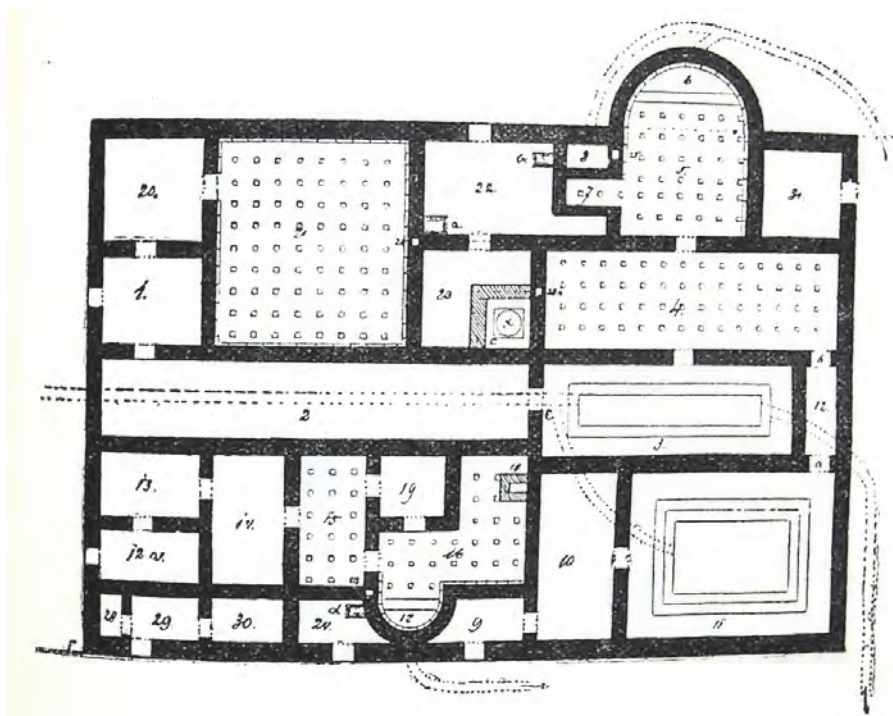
Plan of the roman bath (after KIRÁLY 1891)
